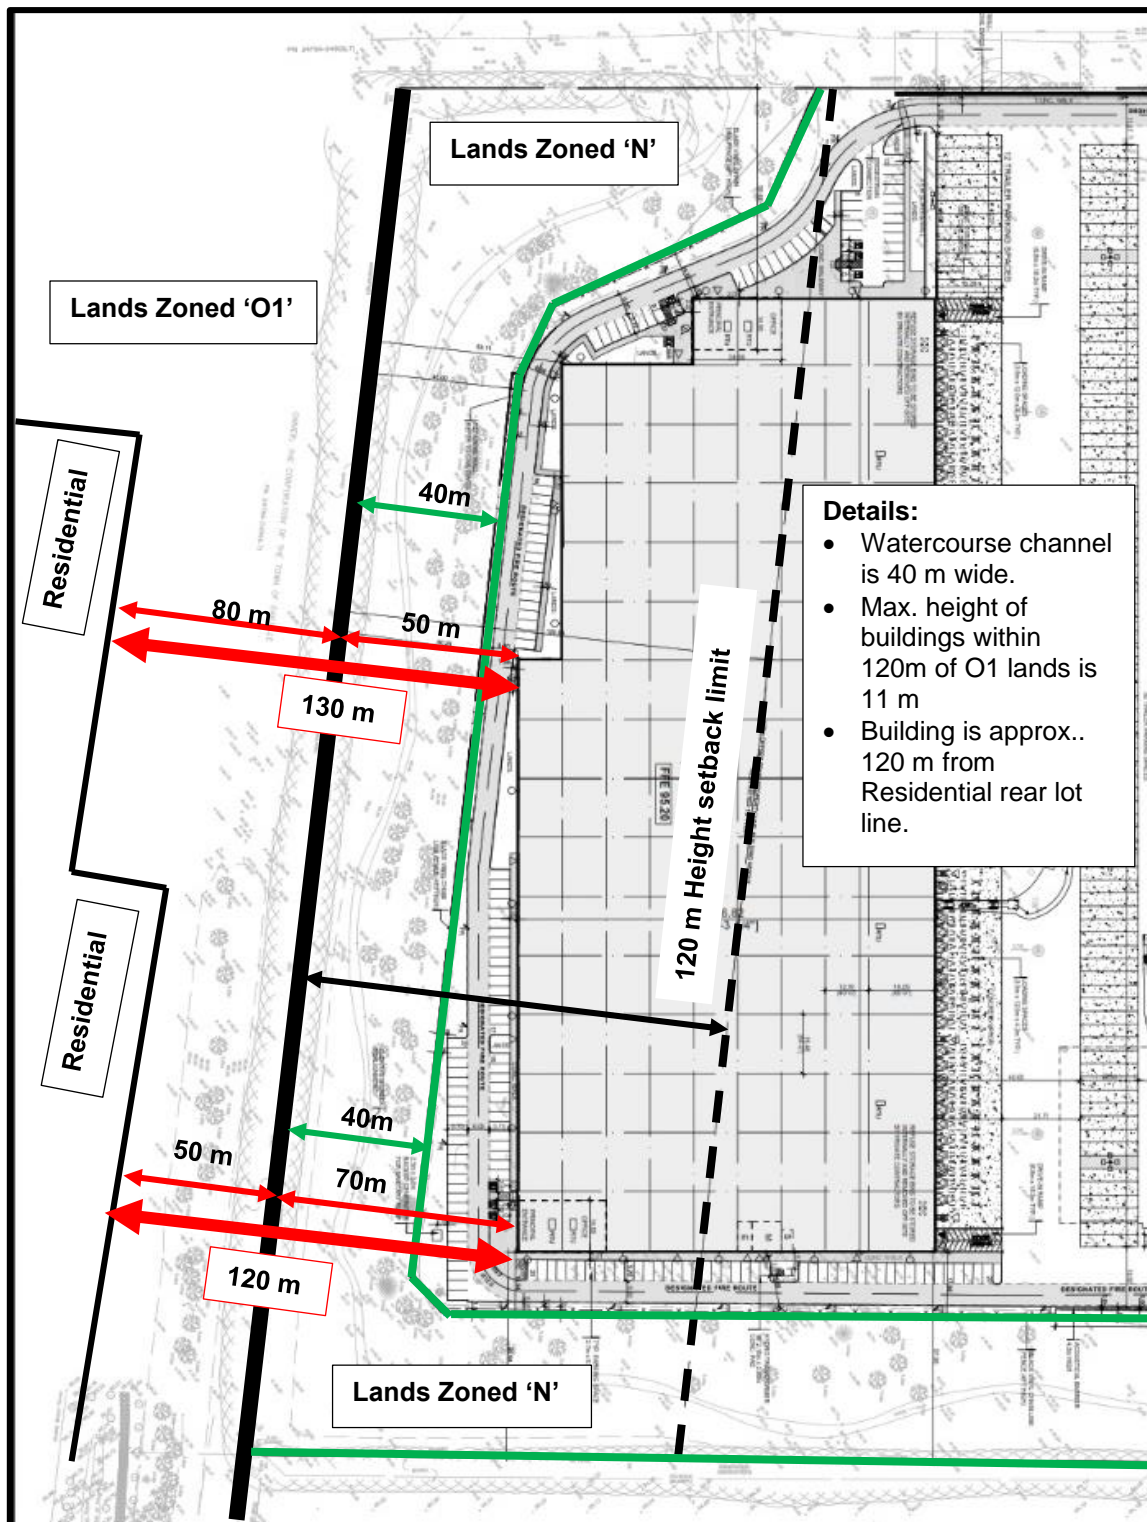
Separation distances between proposed buildings and lands zoned for residential uses
